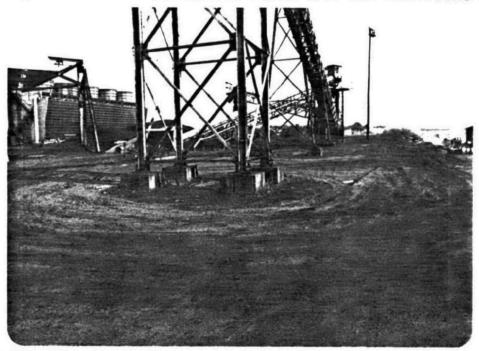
View from ground level facing north showing coal storage area, handling facilities, and the cooling tower serving Boiler 8.
